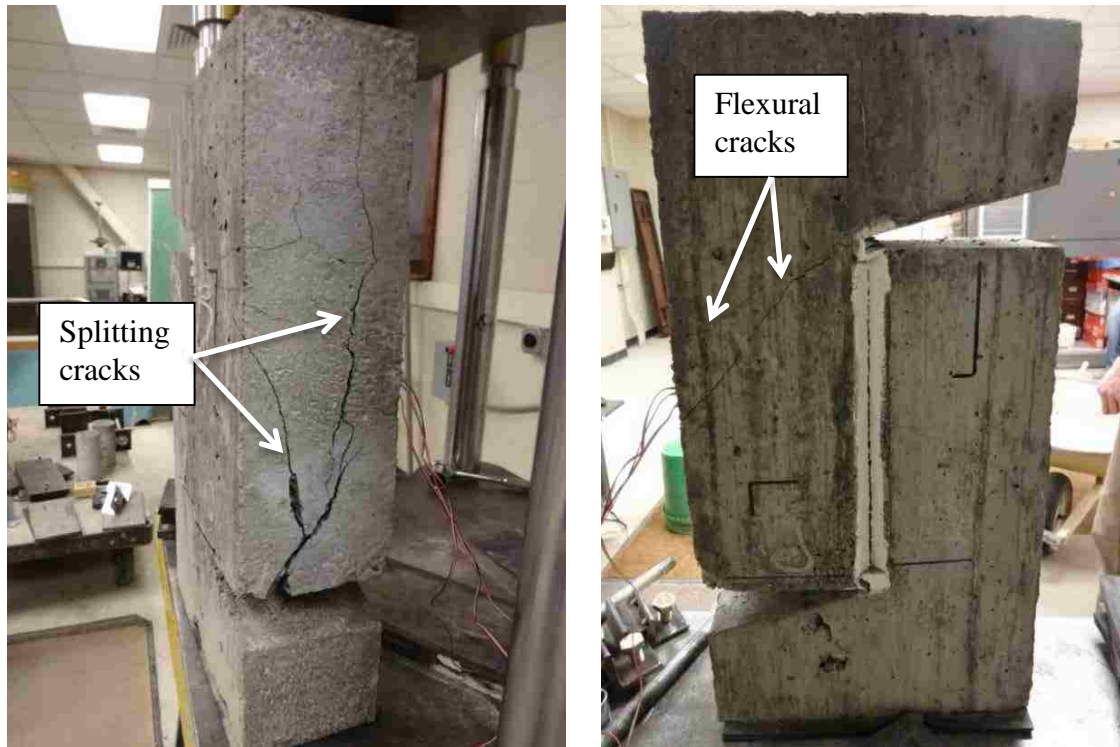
Specimen S-SL-CJ-R-22-1 shown; splitting cracks on side face (left), and flexural cracks on back face (right)
